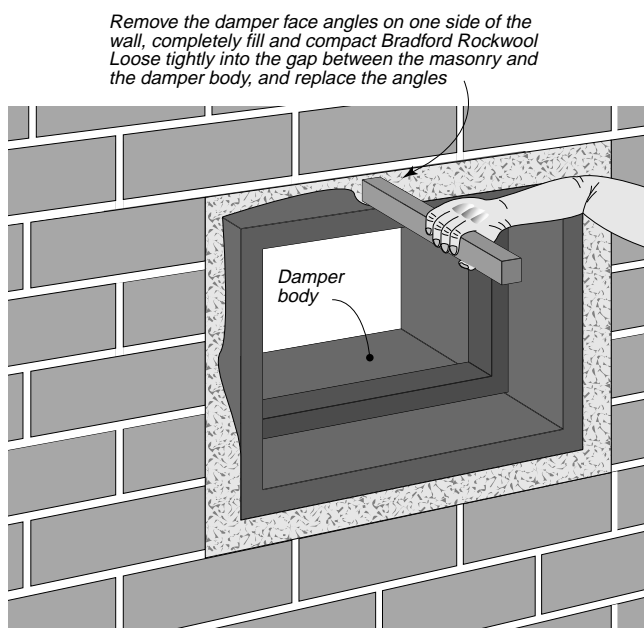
BRADFORD FIRE PROTECTION FOR A FIRE DAMPER INSTALLED DURING THE CONSTRUCTION OF A WALL.
